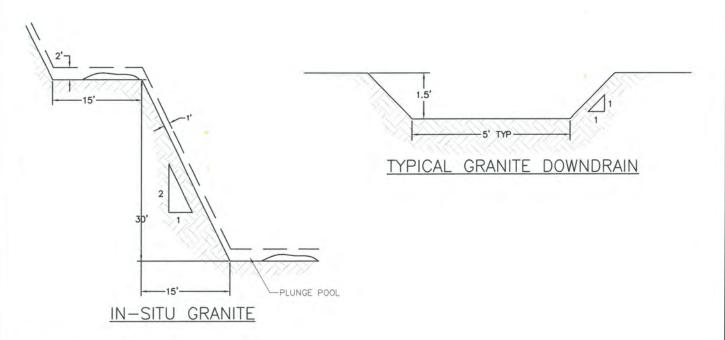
RECLAMATION WATER MANAGEMENT PLAN
